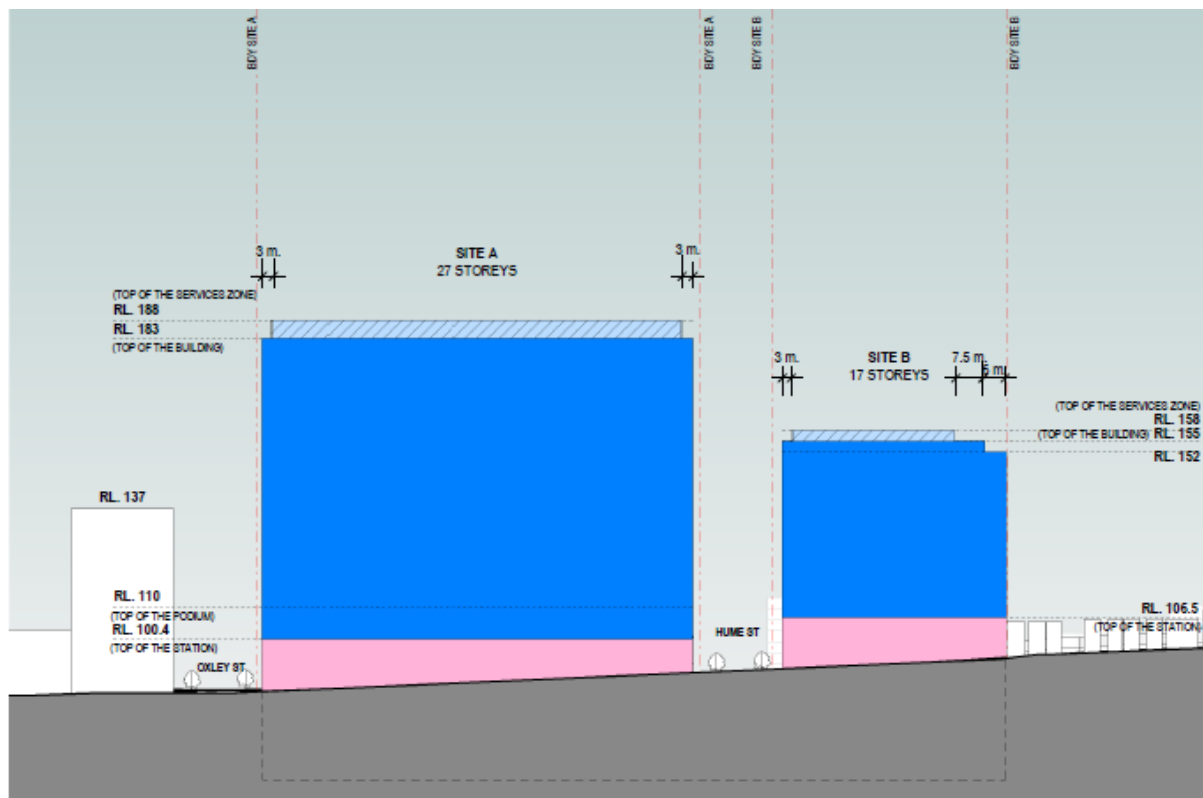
West elevation of the Exhibited Scheme building envelope
